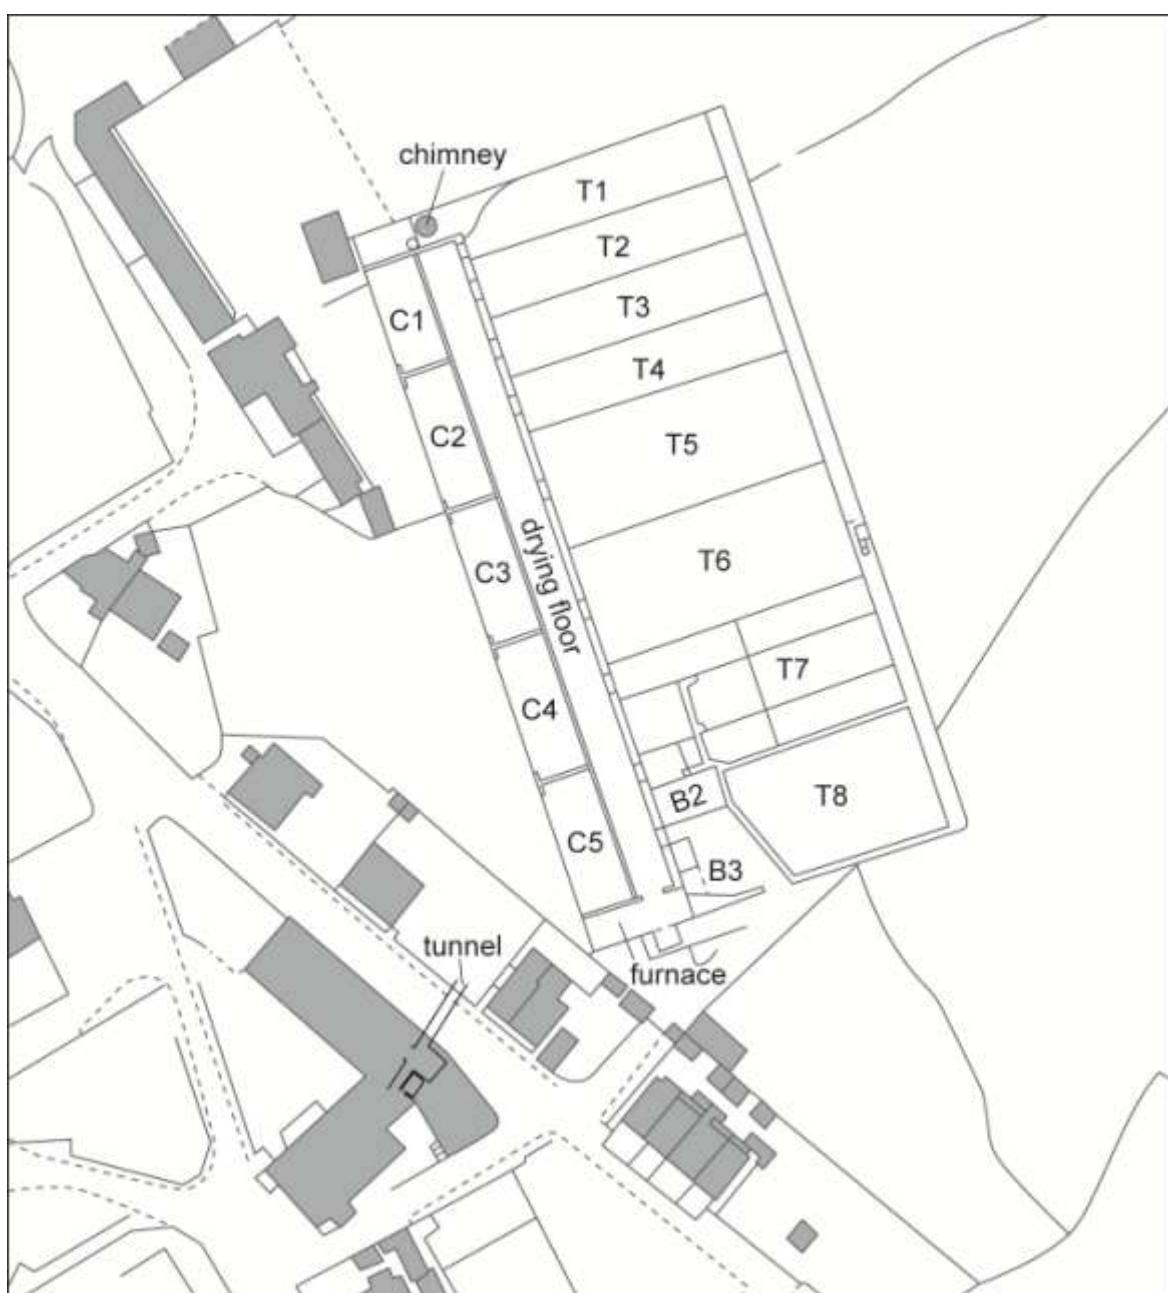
SITE PLAN BASED ON THE 1969 OS MAP, SHOWING THE LOCATION OF NAMED STRUCTURES.
